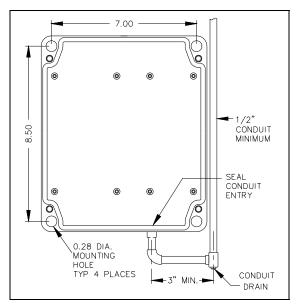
Bottom entry conduit recommended for non-metallic enclosures
